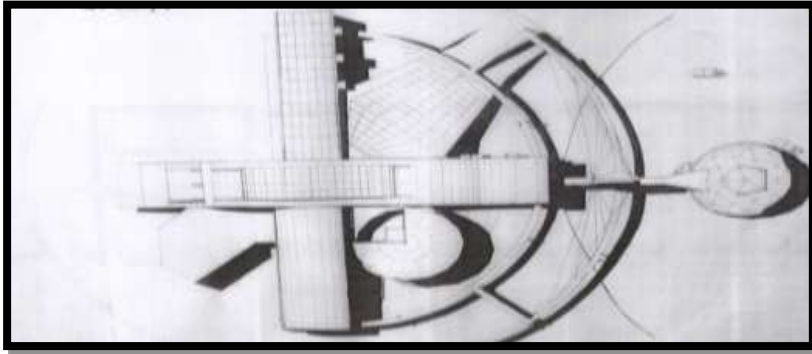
The same student's manual drafting of Expo Centre site plan and elevation
